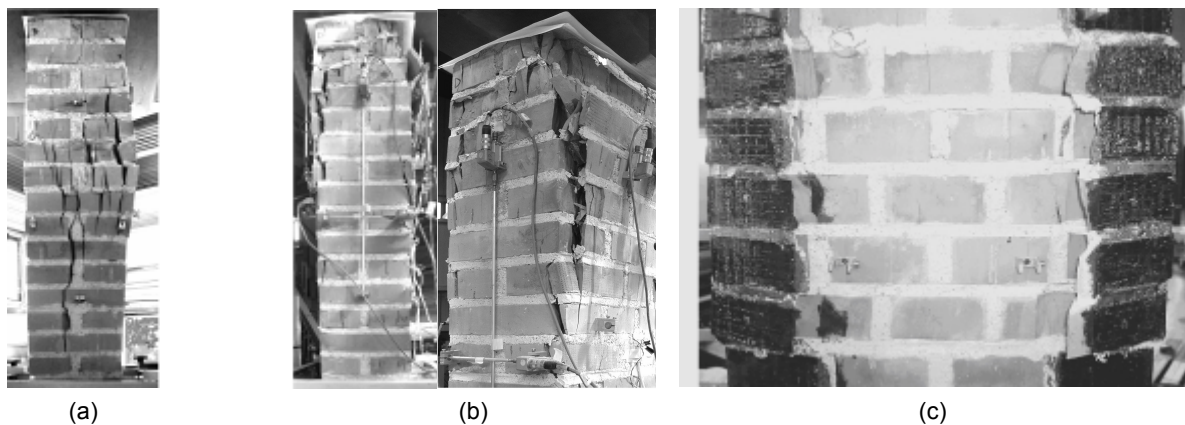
(a) Crack pattern of the unreinforced specimen, (b) (c) crack pattern of CRFP reinforced panels with material spalling and, (c) with peeling of CRFP sheet (Saisi et al., 2004).
